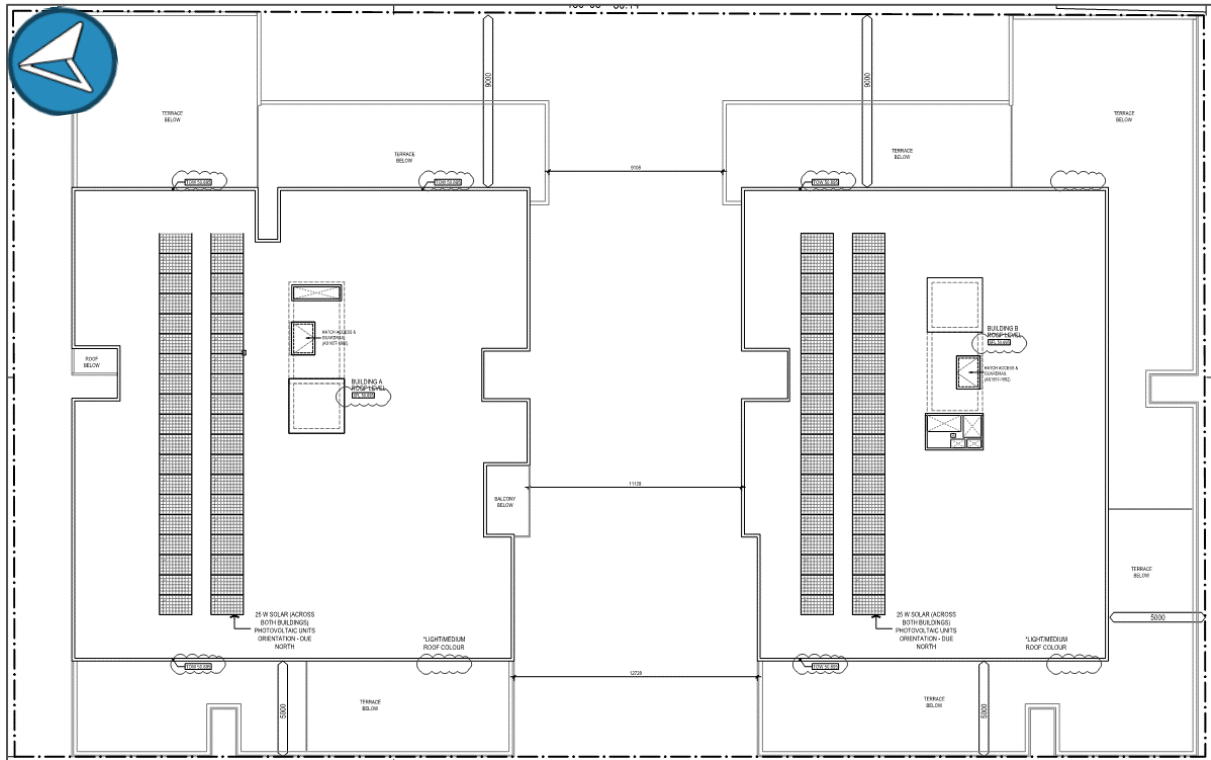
Proposed Roof Plan (Image Source: Artisan Architects)
